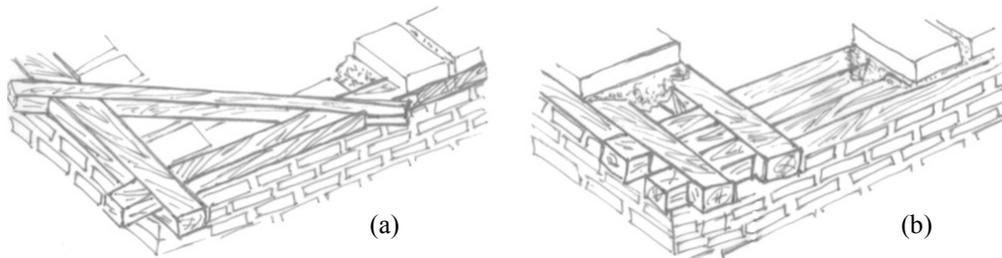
Improved corner joint: (a) with single timber and diagonal members for bracing at corners; (b) with two timber in parallel
